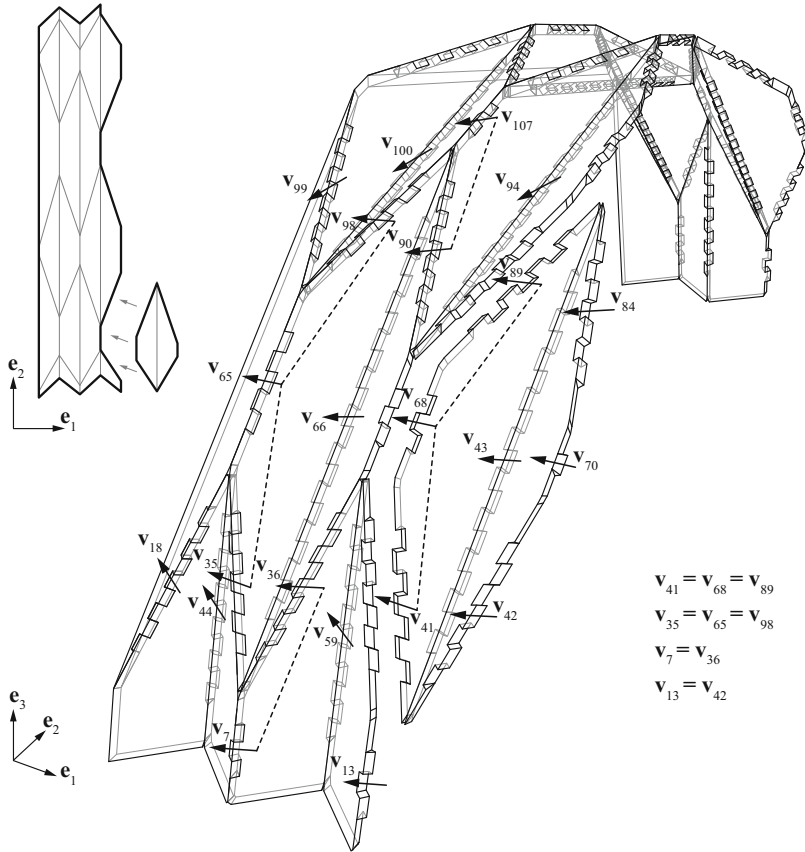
Left-to-right-side assembly of the Interlocking folded plate shell prototype. Built from Kerto-Q structural grade LVL panels (7-layer, I-III-I)
